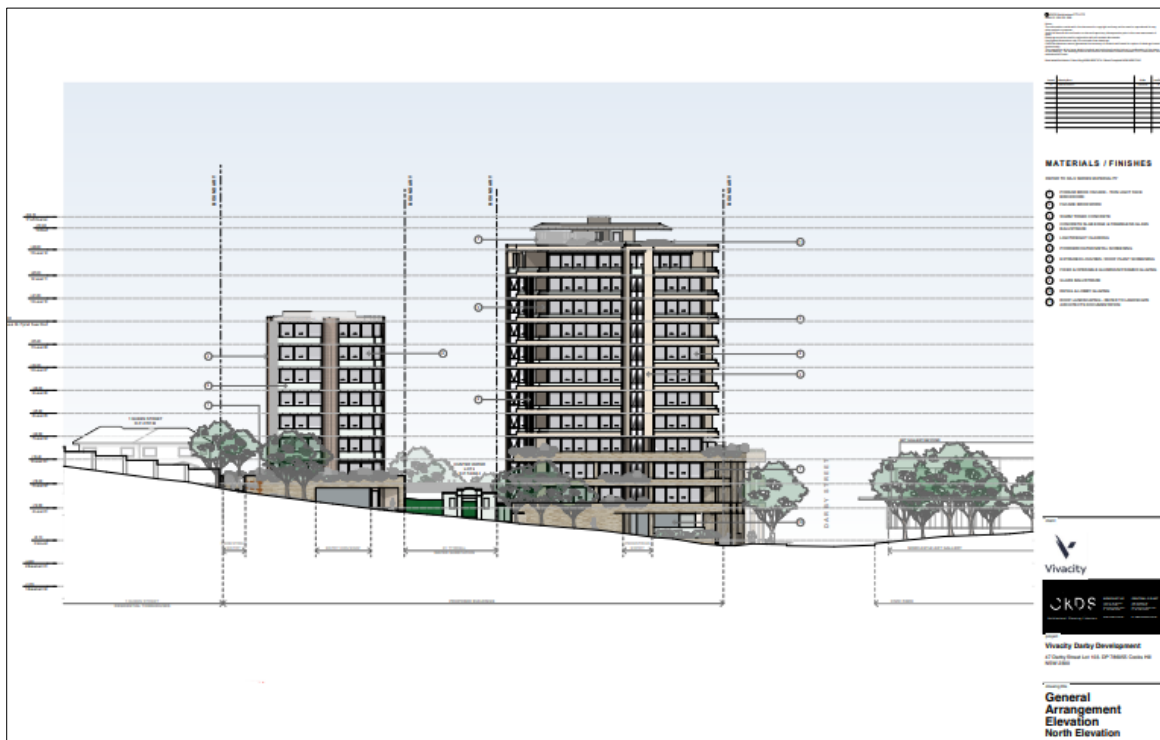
Tyrrell Street Elevation. Source: CKDS December 2025
